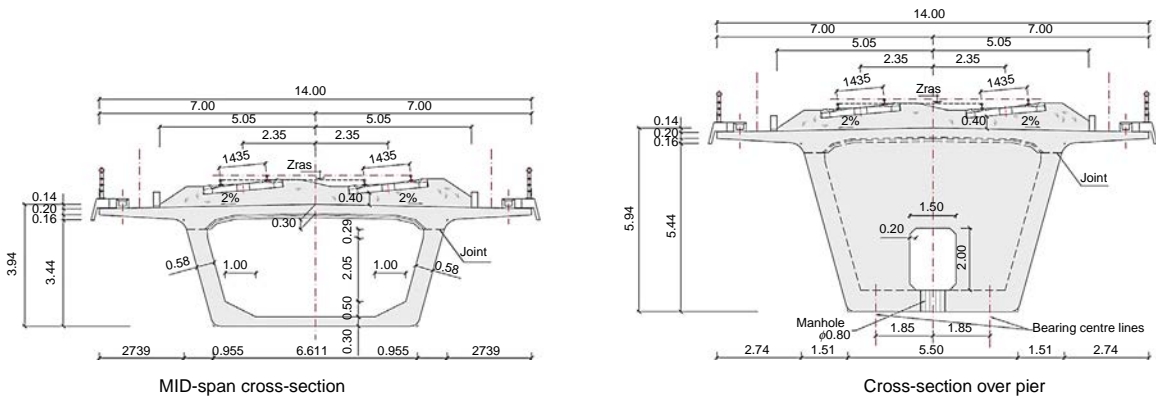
Standard box cross-sections: mid-span (left) and over piers (right).
